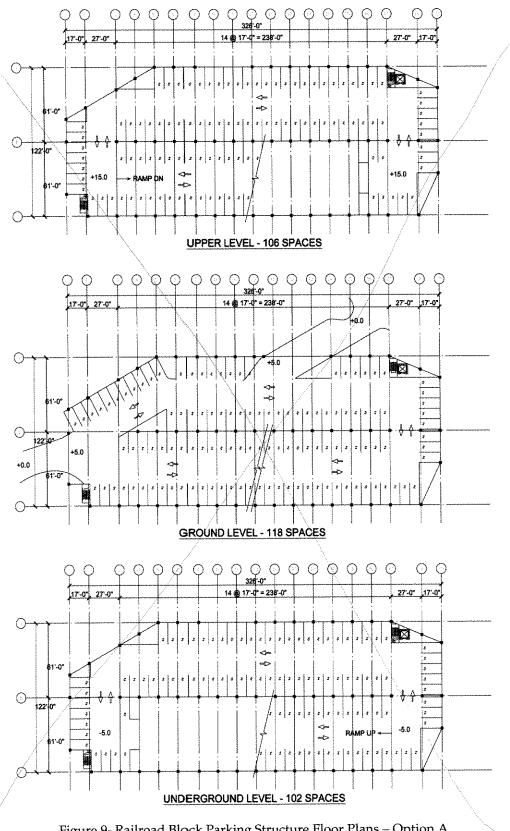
Railroad Block Parking Structure Floor Plans – Option A (Total Parking Spaces = 326 from Reference 2)
